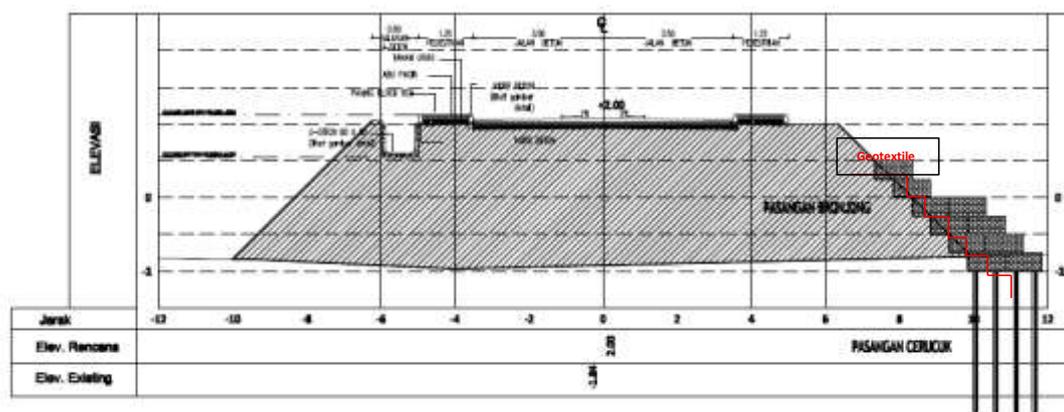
Cross-Section of the Coastal Embankment Showing Geotextile and Gabion Integration
